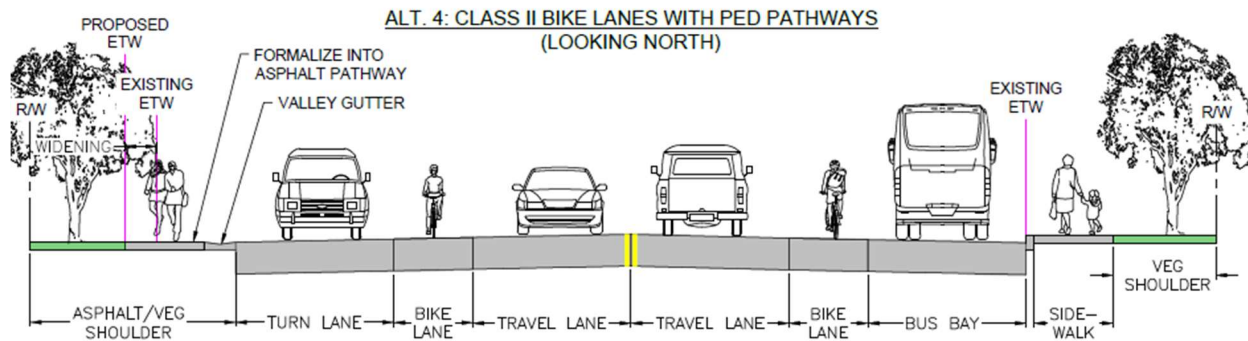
Ringwood Avenue Alternative 4 Near MAHS
